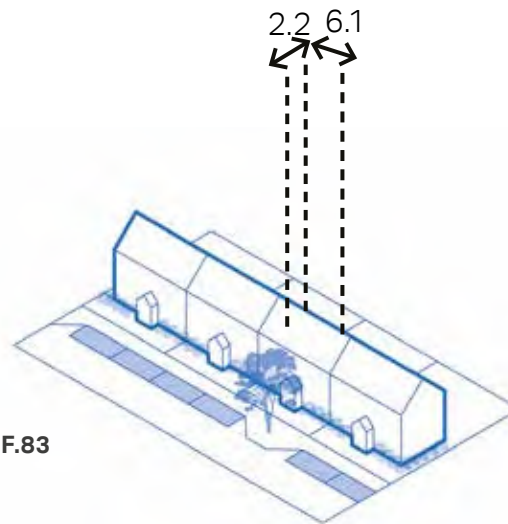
Illustrative diagram showing an indicative layout and minimum dimensions of on-street parking
